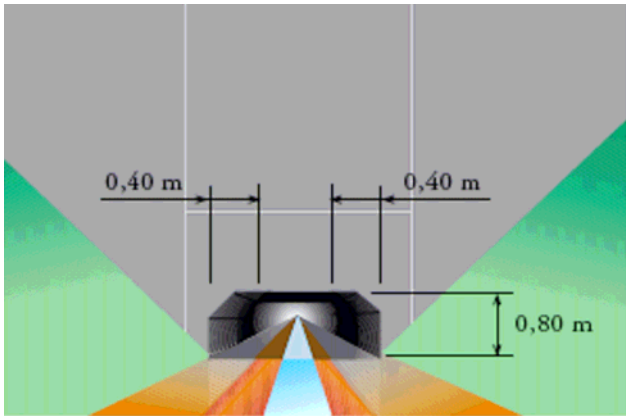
1.20 m wide culvert with two 0.40 m wide ledges (headroom: 0.80 m)
